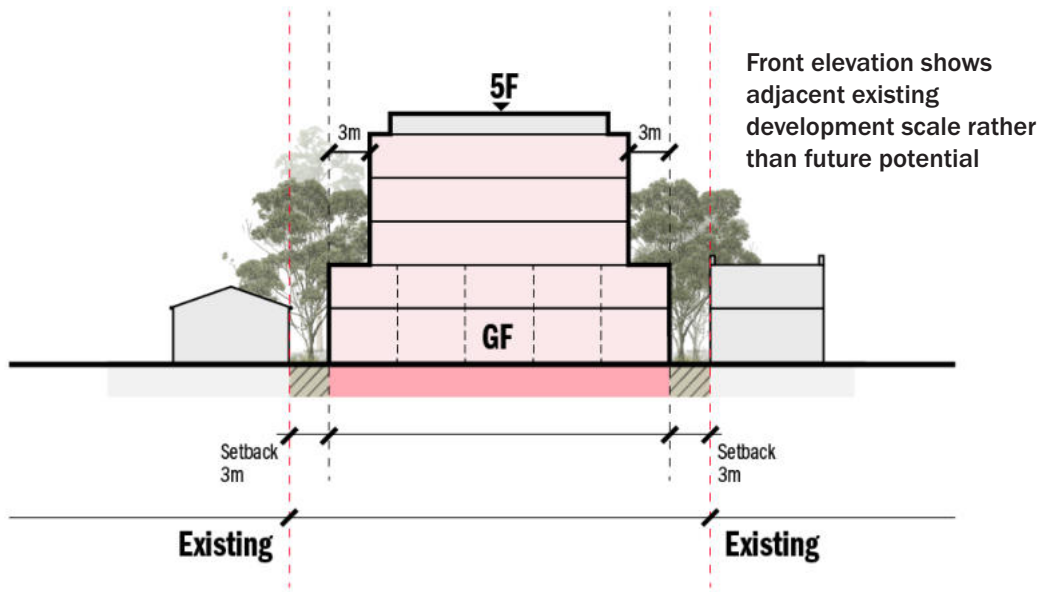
Section 1 - Front elevation of five storey residential building on Norton Street (assumed five lot amalgamation)
